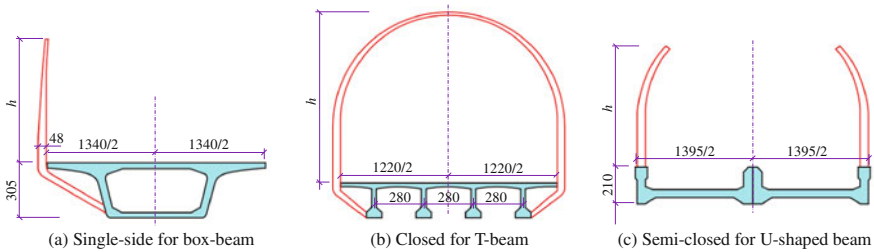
Schemed wind barriers for box-beam, T-beam, and U-shaped beam (unit: cm)
